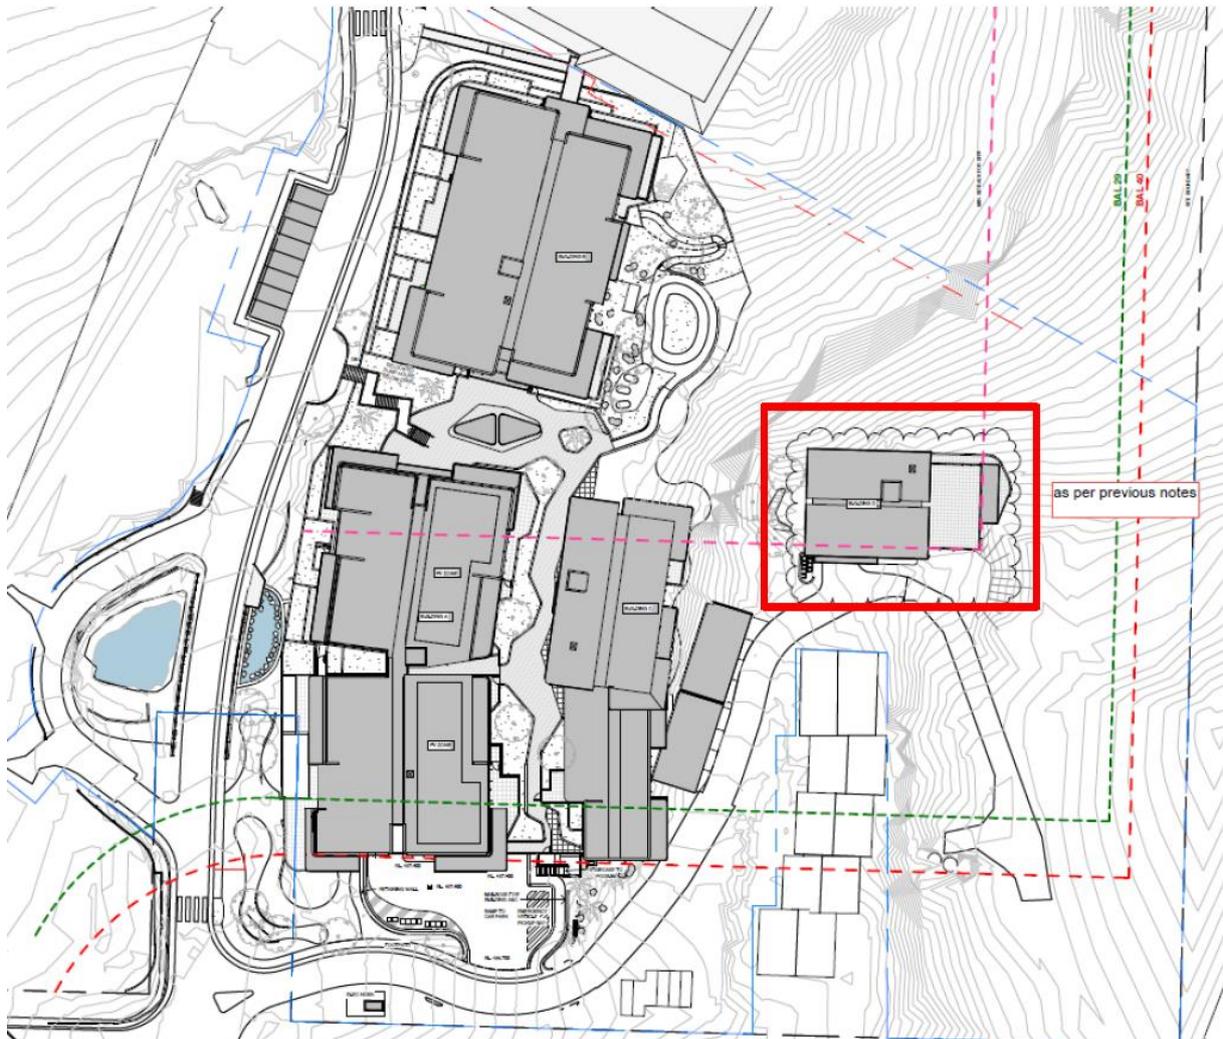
Site Plan showing location of Building D in red (Source: PTW)
